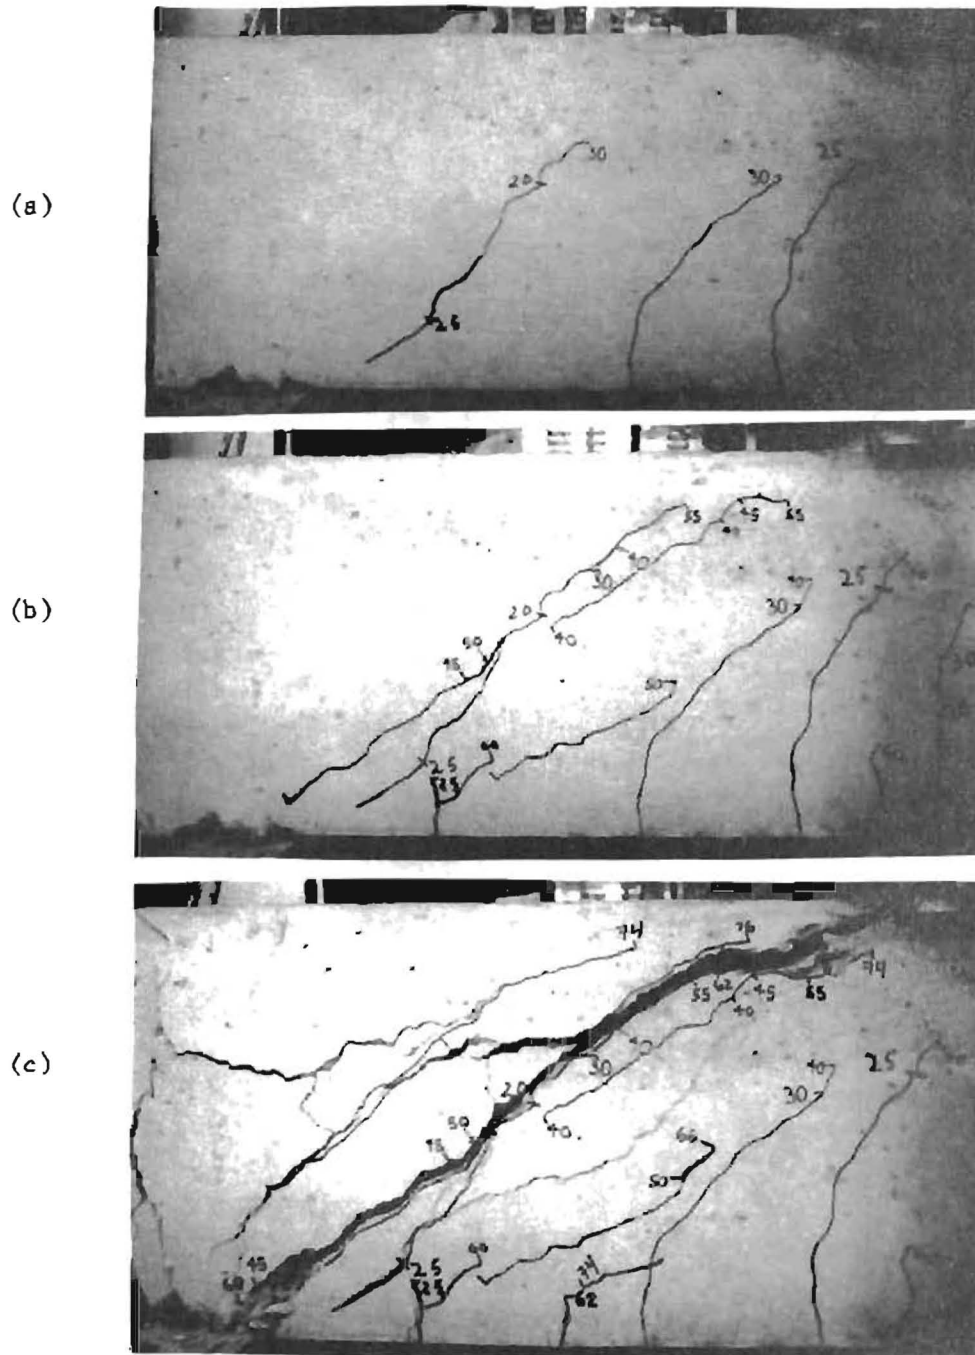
Crack patterns of beam RL-1.25 at load stages of 60 kips, 100 kips, and failure (top to bottom)
